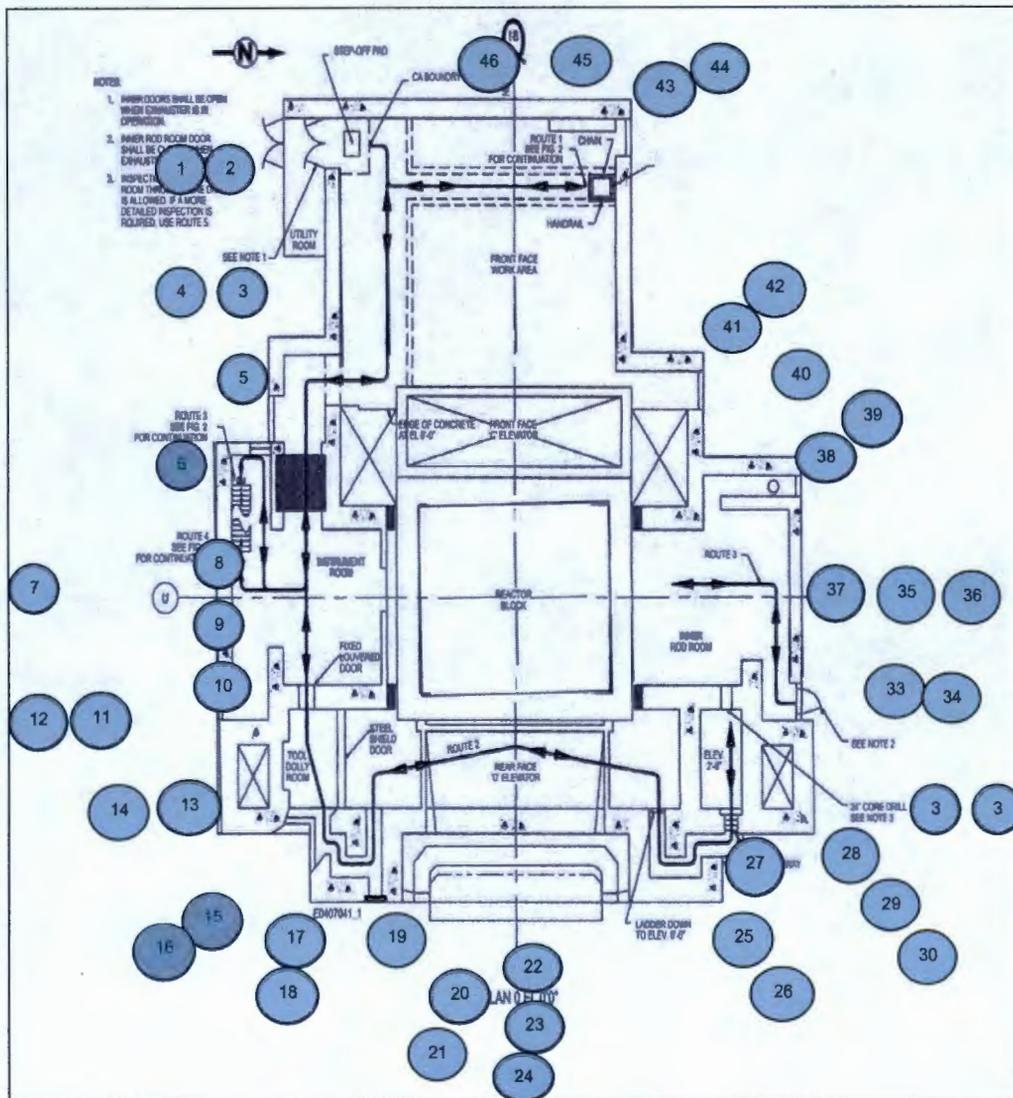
Exterior Building Details - Grade Level, SW Wall Areas.
